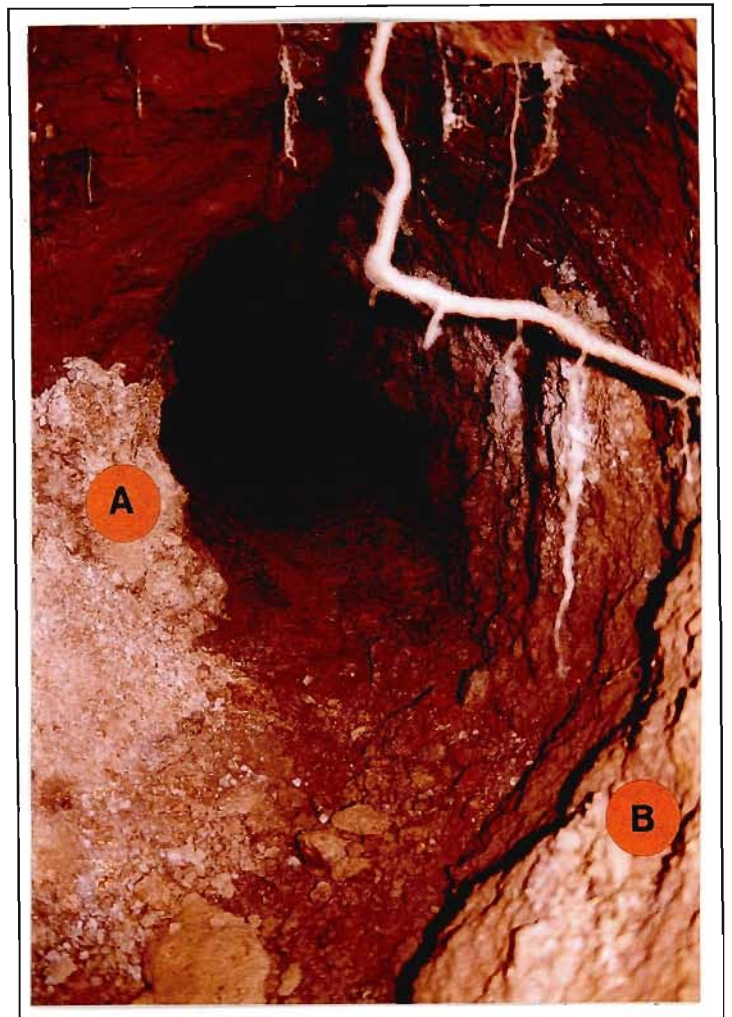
(b): The outlet of the large pipe system (II, Figure 5.3.3.2) that extends well beyond the back slope drainage system at the Langeni site.
